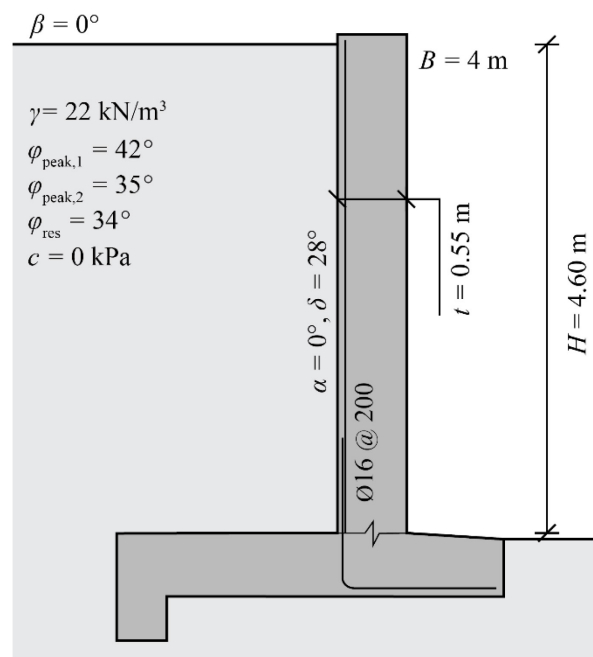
Example wall, including details of geometry, reinforcement, and soil.
